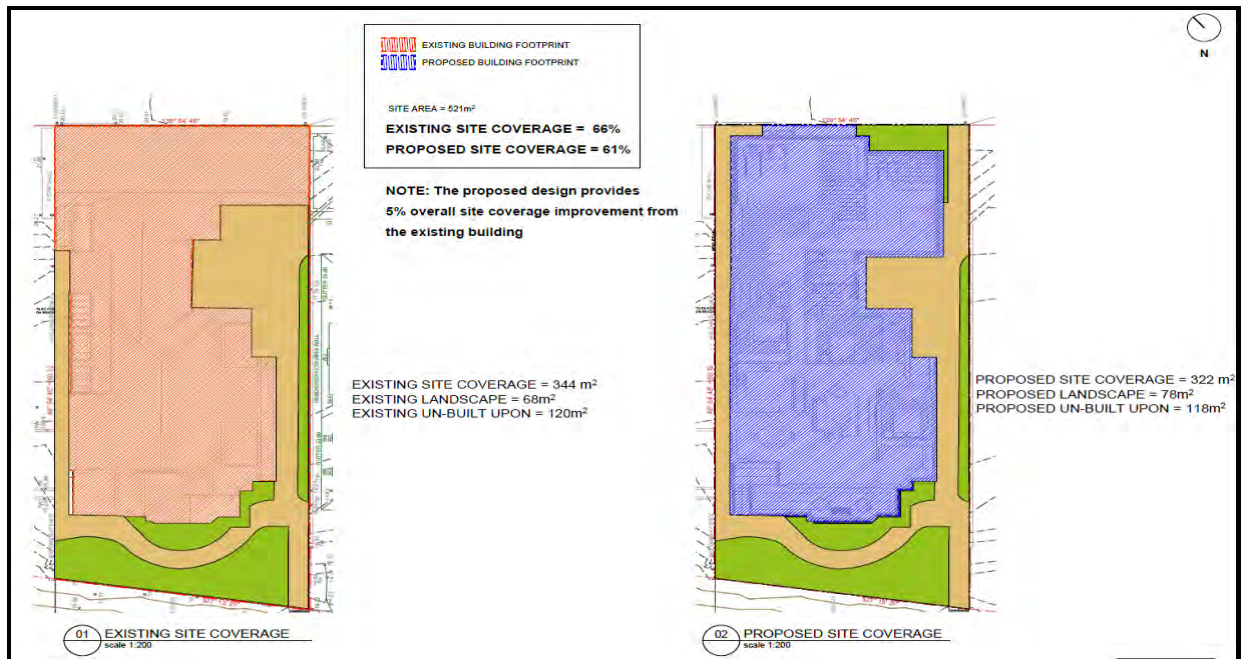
Site area calculation plan showing the existing and proposed site coverage, unbuilt upon area and landscaped area.
